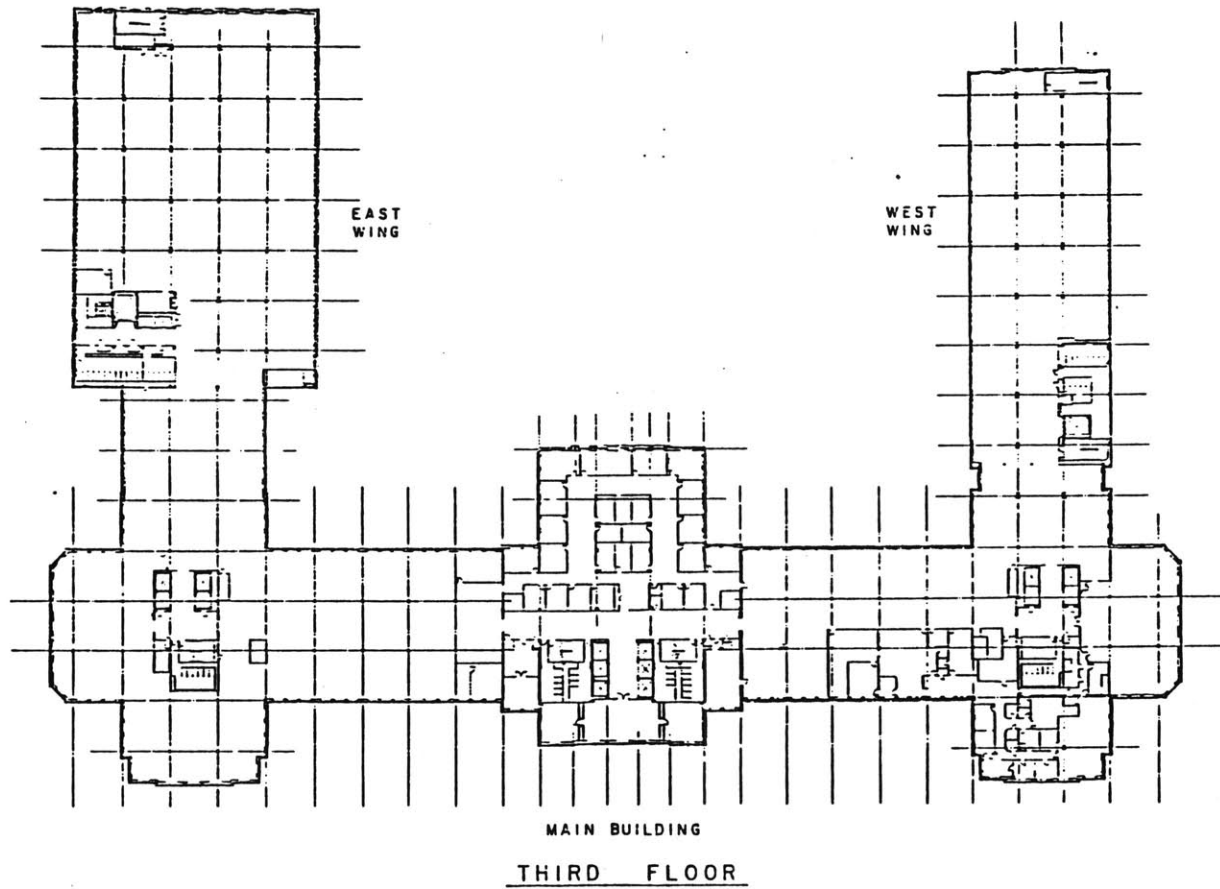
PLAN THIRD FLOOR OF MAIN BUILDING
